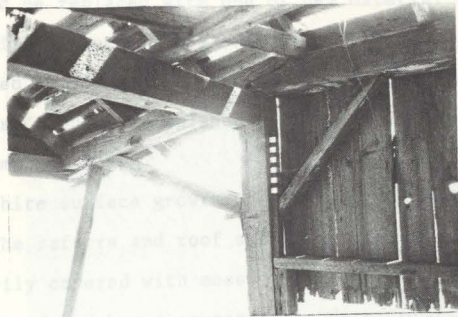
Photo shows broken top plate and poor connection between post and beam.
